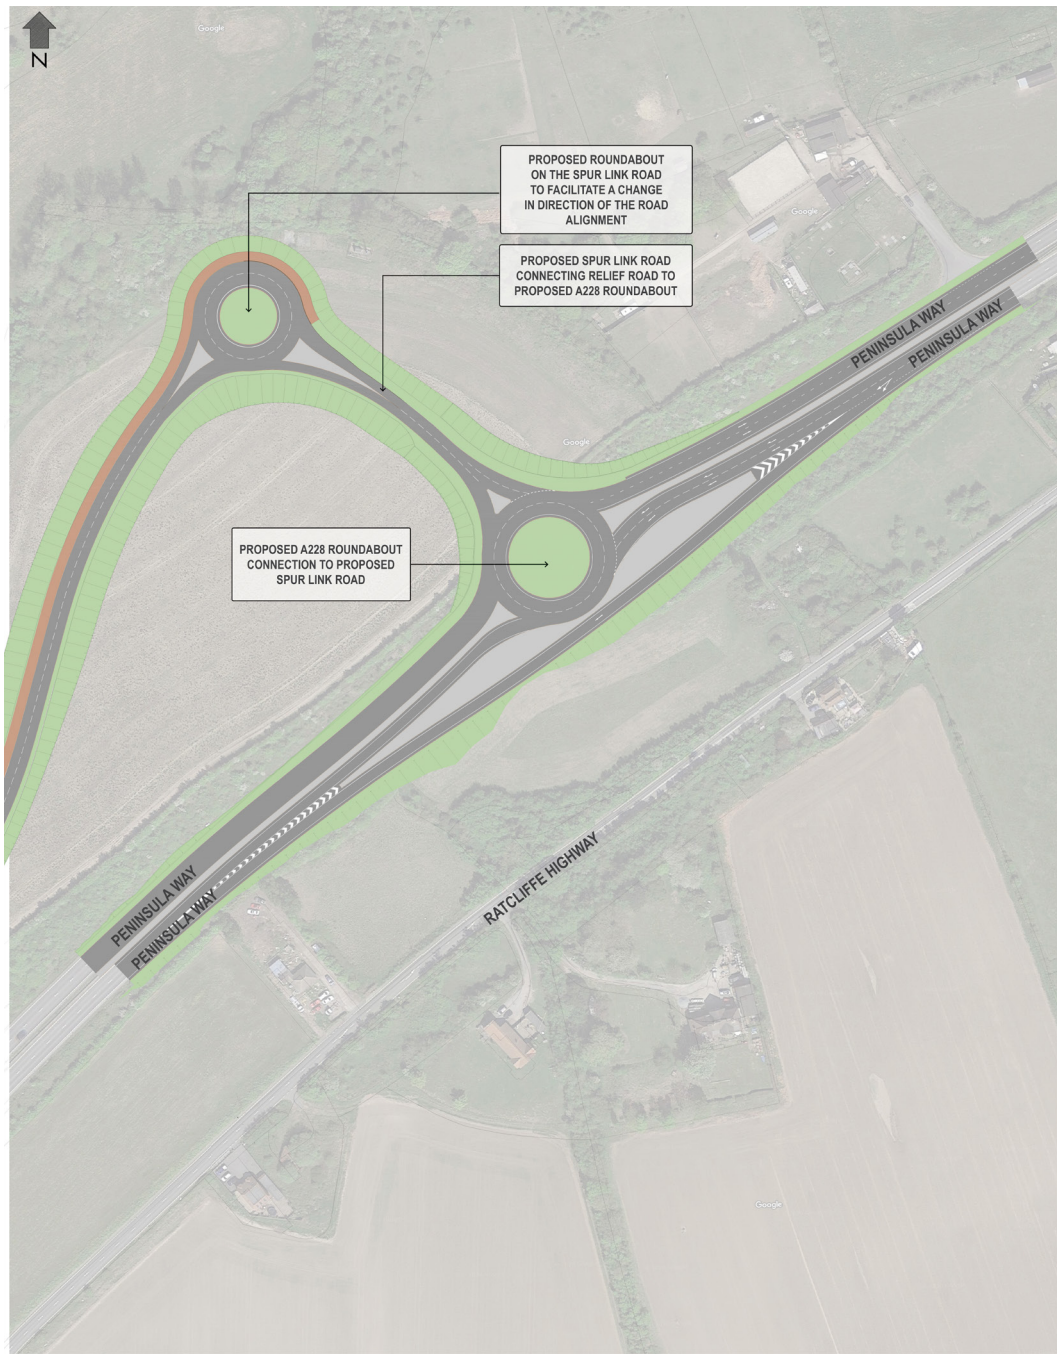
shows the proposed spur link road and its intersection with the A228 Peninsula Way where a proposed roundabout will be introduced to facilitate a change in direction of the road alignment (Alignment B). A proposed roundabout will be between Main Road Hoo and Bell's Lane.
